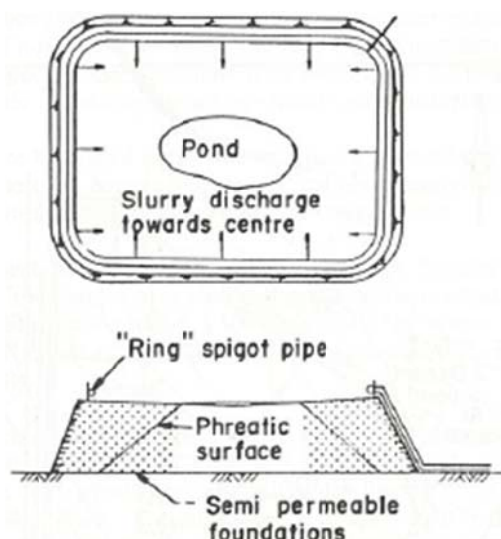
Plan and section through a typical ring main spigot tailings dam (Cooper, 1988)
